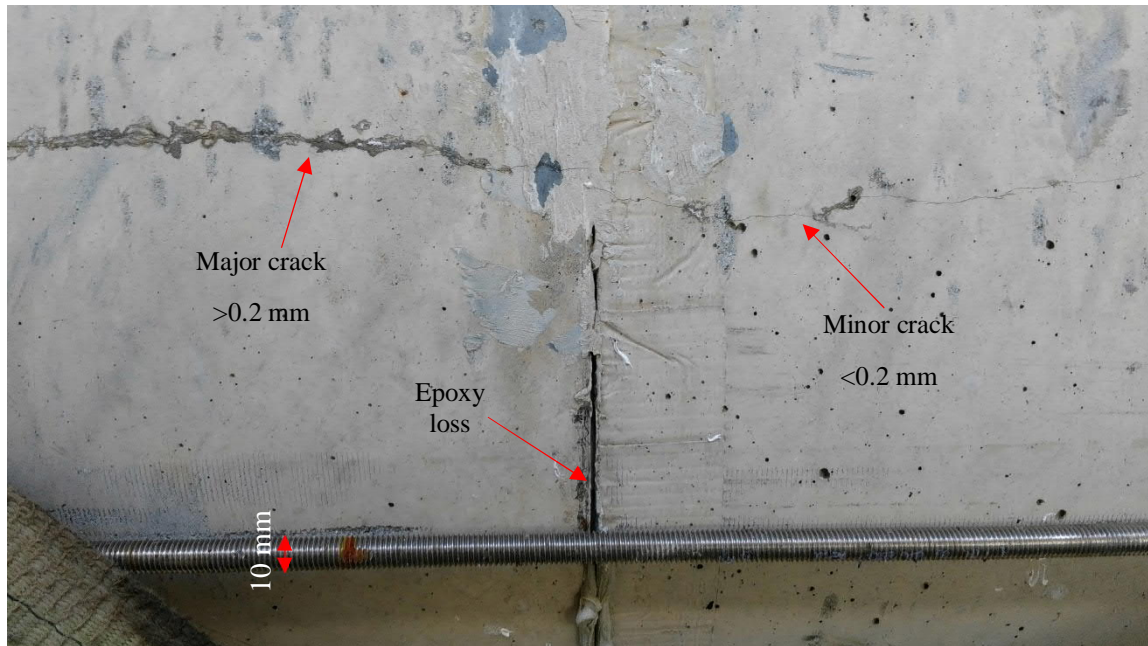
Open plan of the prototype and major damages according to visual inspection (unit mm)
